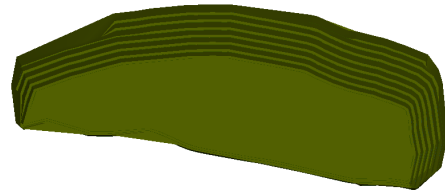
Sketch of the planned geometry of the benches in the final back wall.
